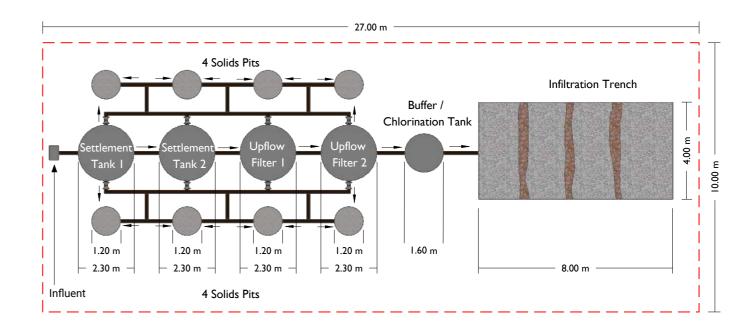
Site layout plan - Upflow Filter plant 3 (NGO 2)
